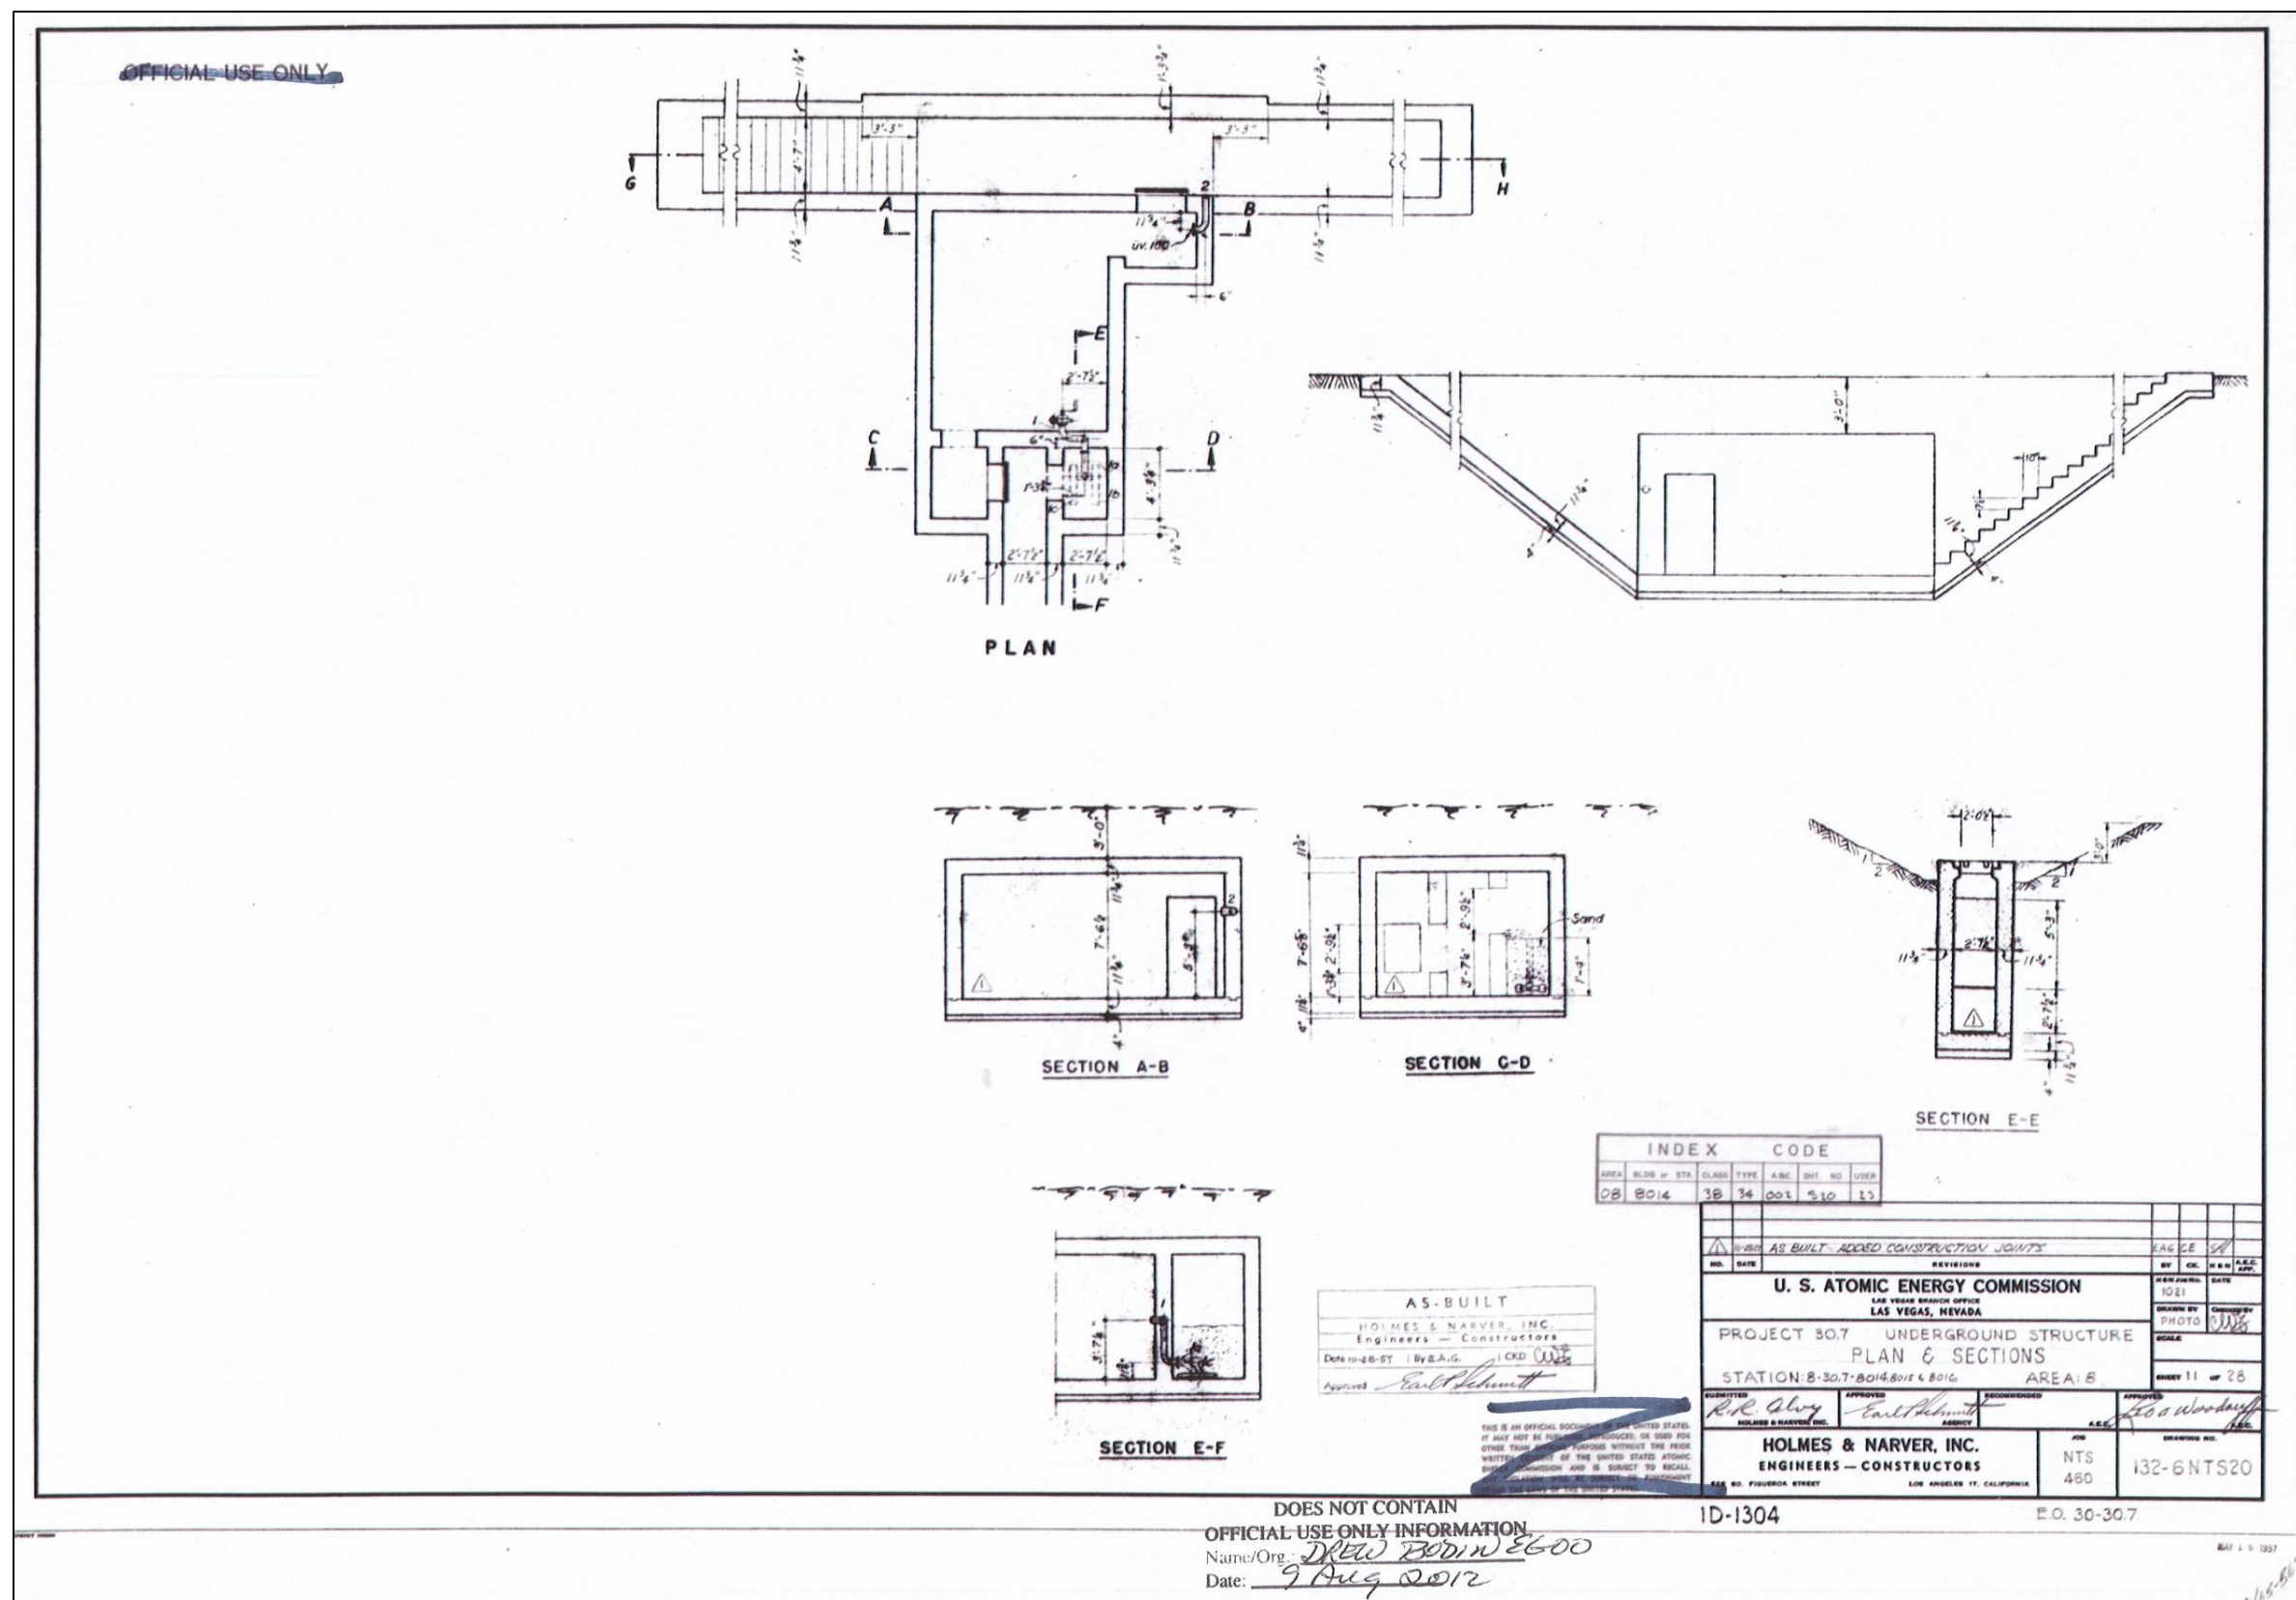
S917 and S918, German underground personnel shelters RCa and RCb, plan and sections.
